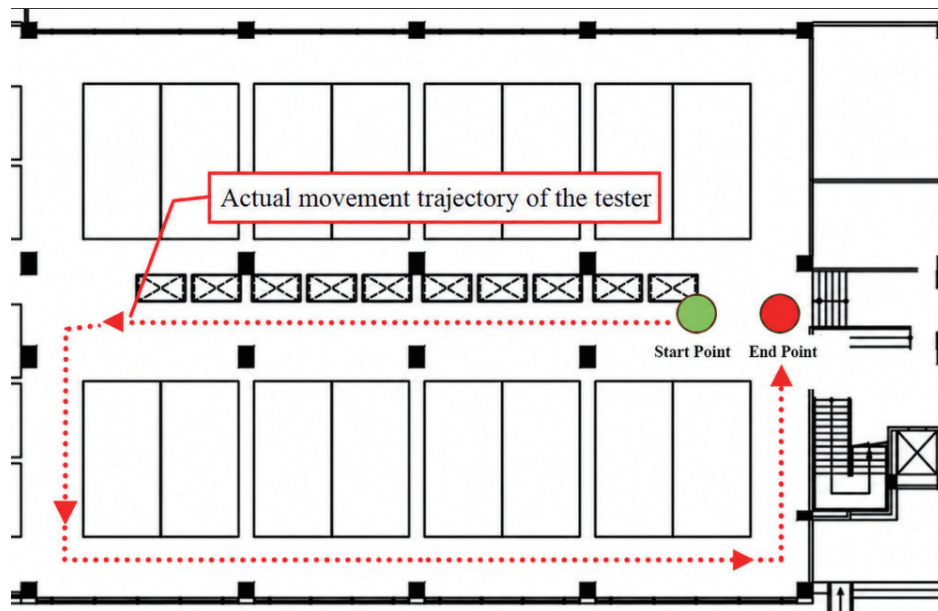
(Color online) Floor plan and UWB access point deployment in RO water treatment area.
